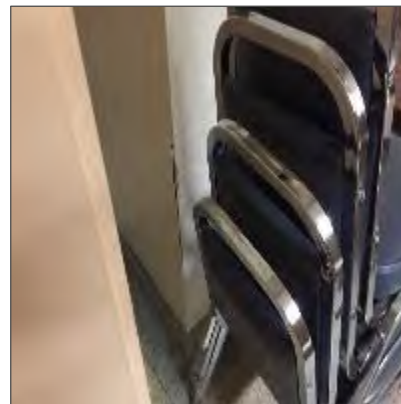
Damaged asbestos-containing drywall joint compound at wall corner, Margaret Charter's Auditorium, Basement.
